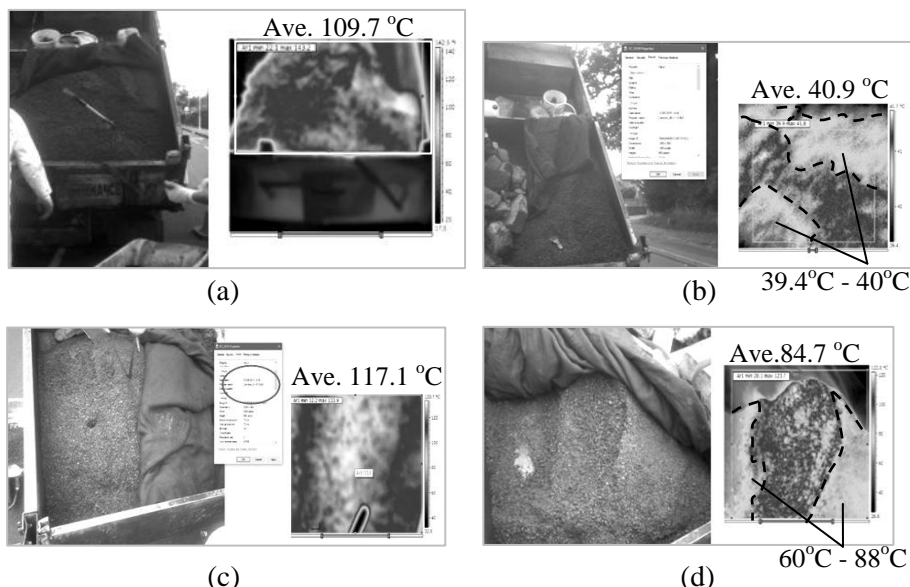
Thermal images of asphalt at (a) Repair site 7, (b) Repair site 8, (c) Repair site 9 and (d) Repair site 10
